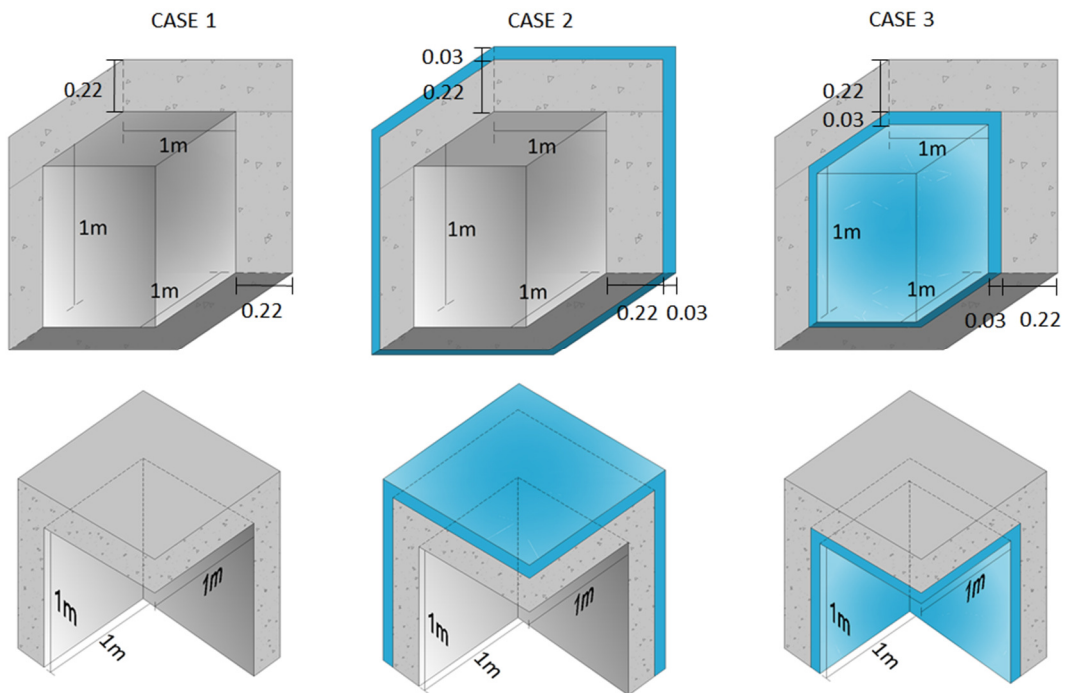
3D Building corner geometry used in the numerical applications: Case 1 – walls and roof without thermal insulation; Case 2 – walls and roof with an external thermal insulation layer; Case 3 – walls and roof with an internal thermal insulation layer (dimensions in m).
